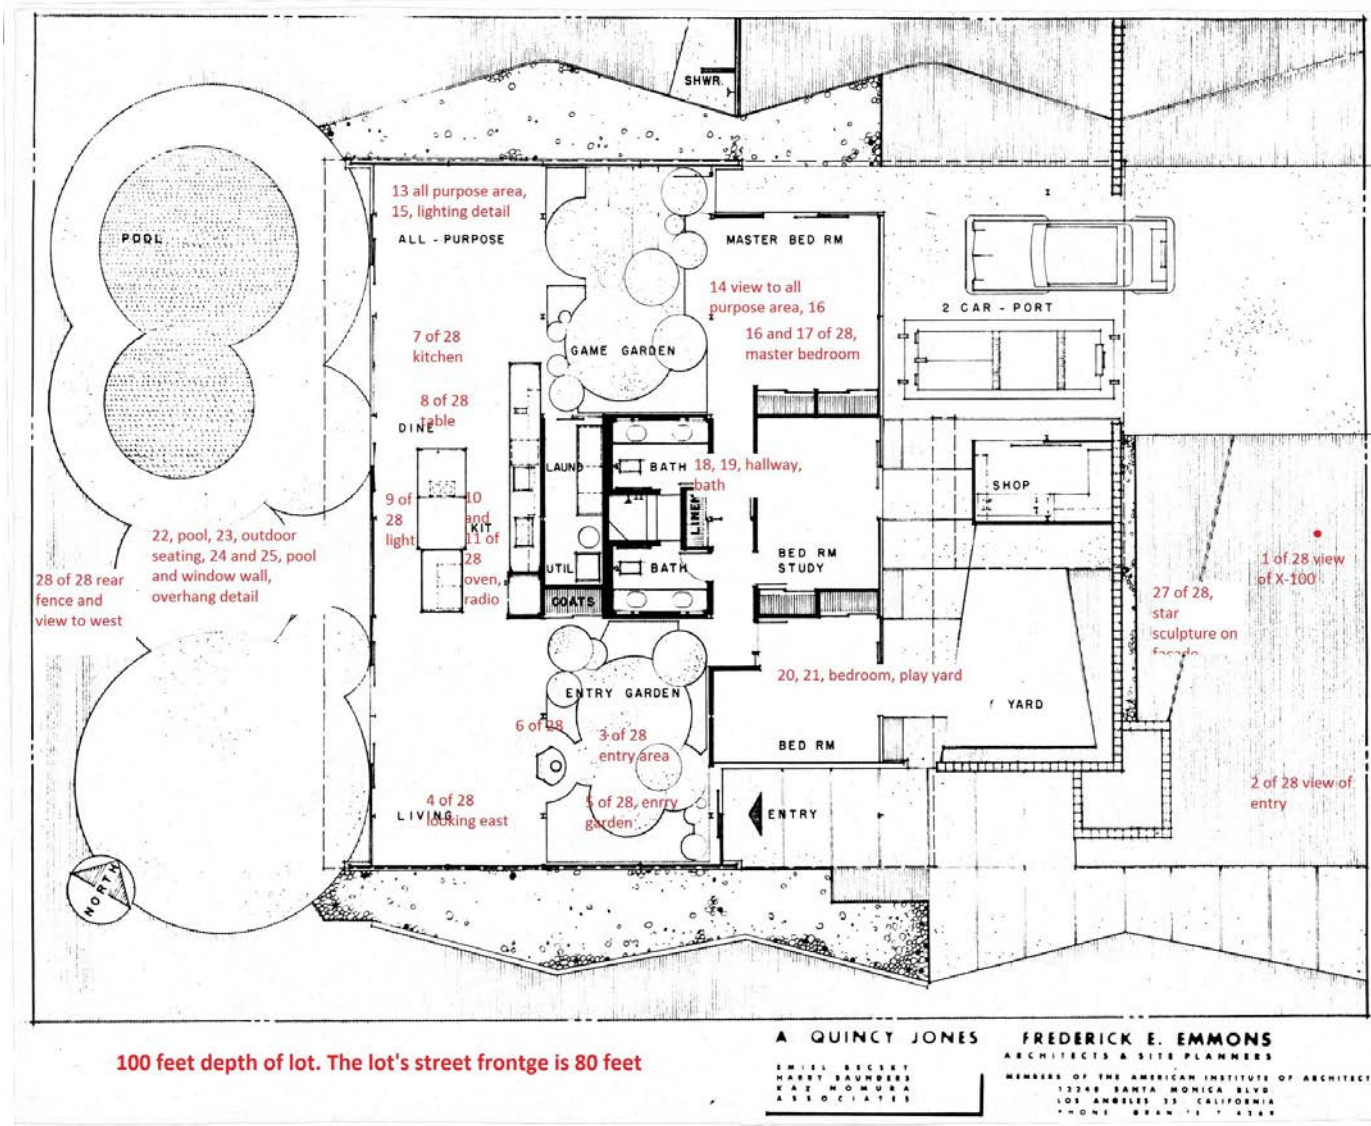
Floor plan of the X-100: Carport opens onto Lexington Avenue
